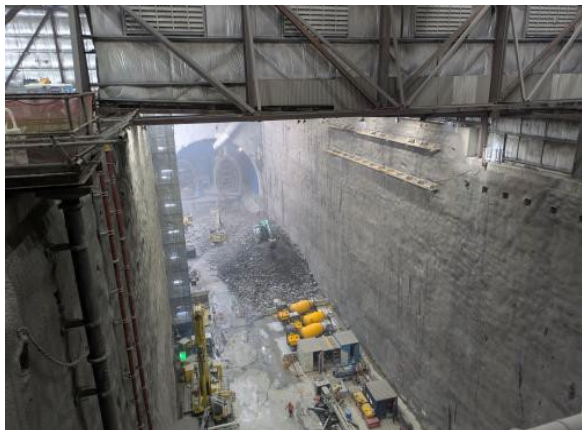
Westmead Site: Excavation of station cavern continuing, with dust suppression measures observed.
